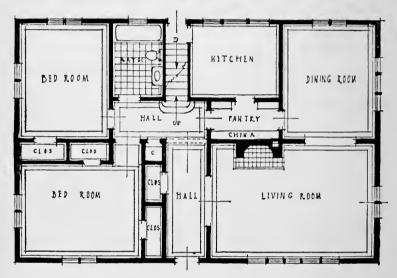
A typical arrangement of all rooms on one floor. The living-rooms and kitchen are grouped snugly together, and the bedrooms are grouped and arranged to open from a retired ball.
